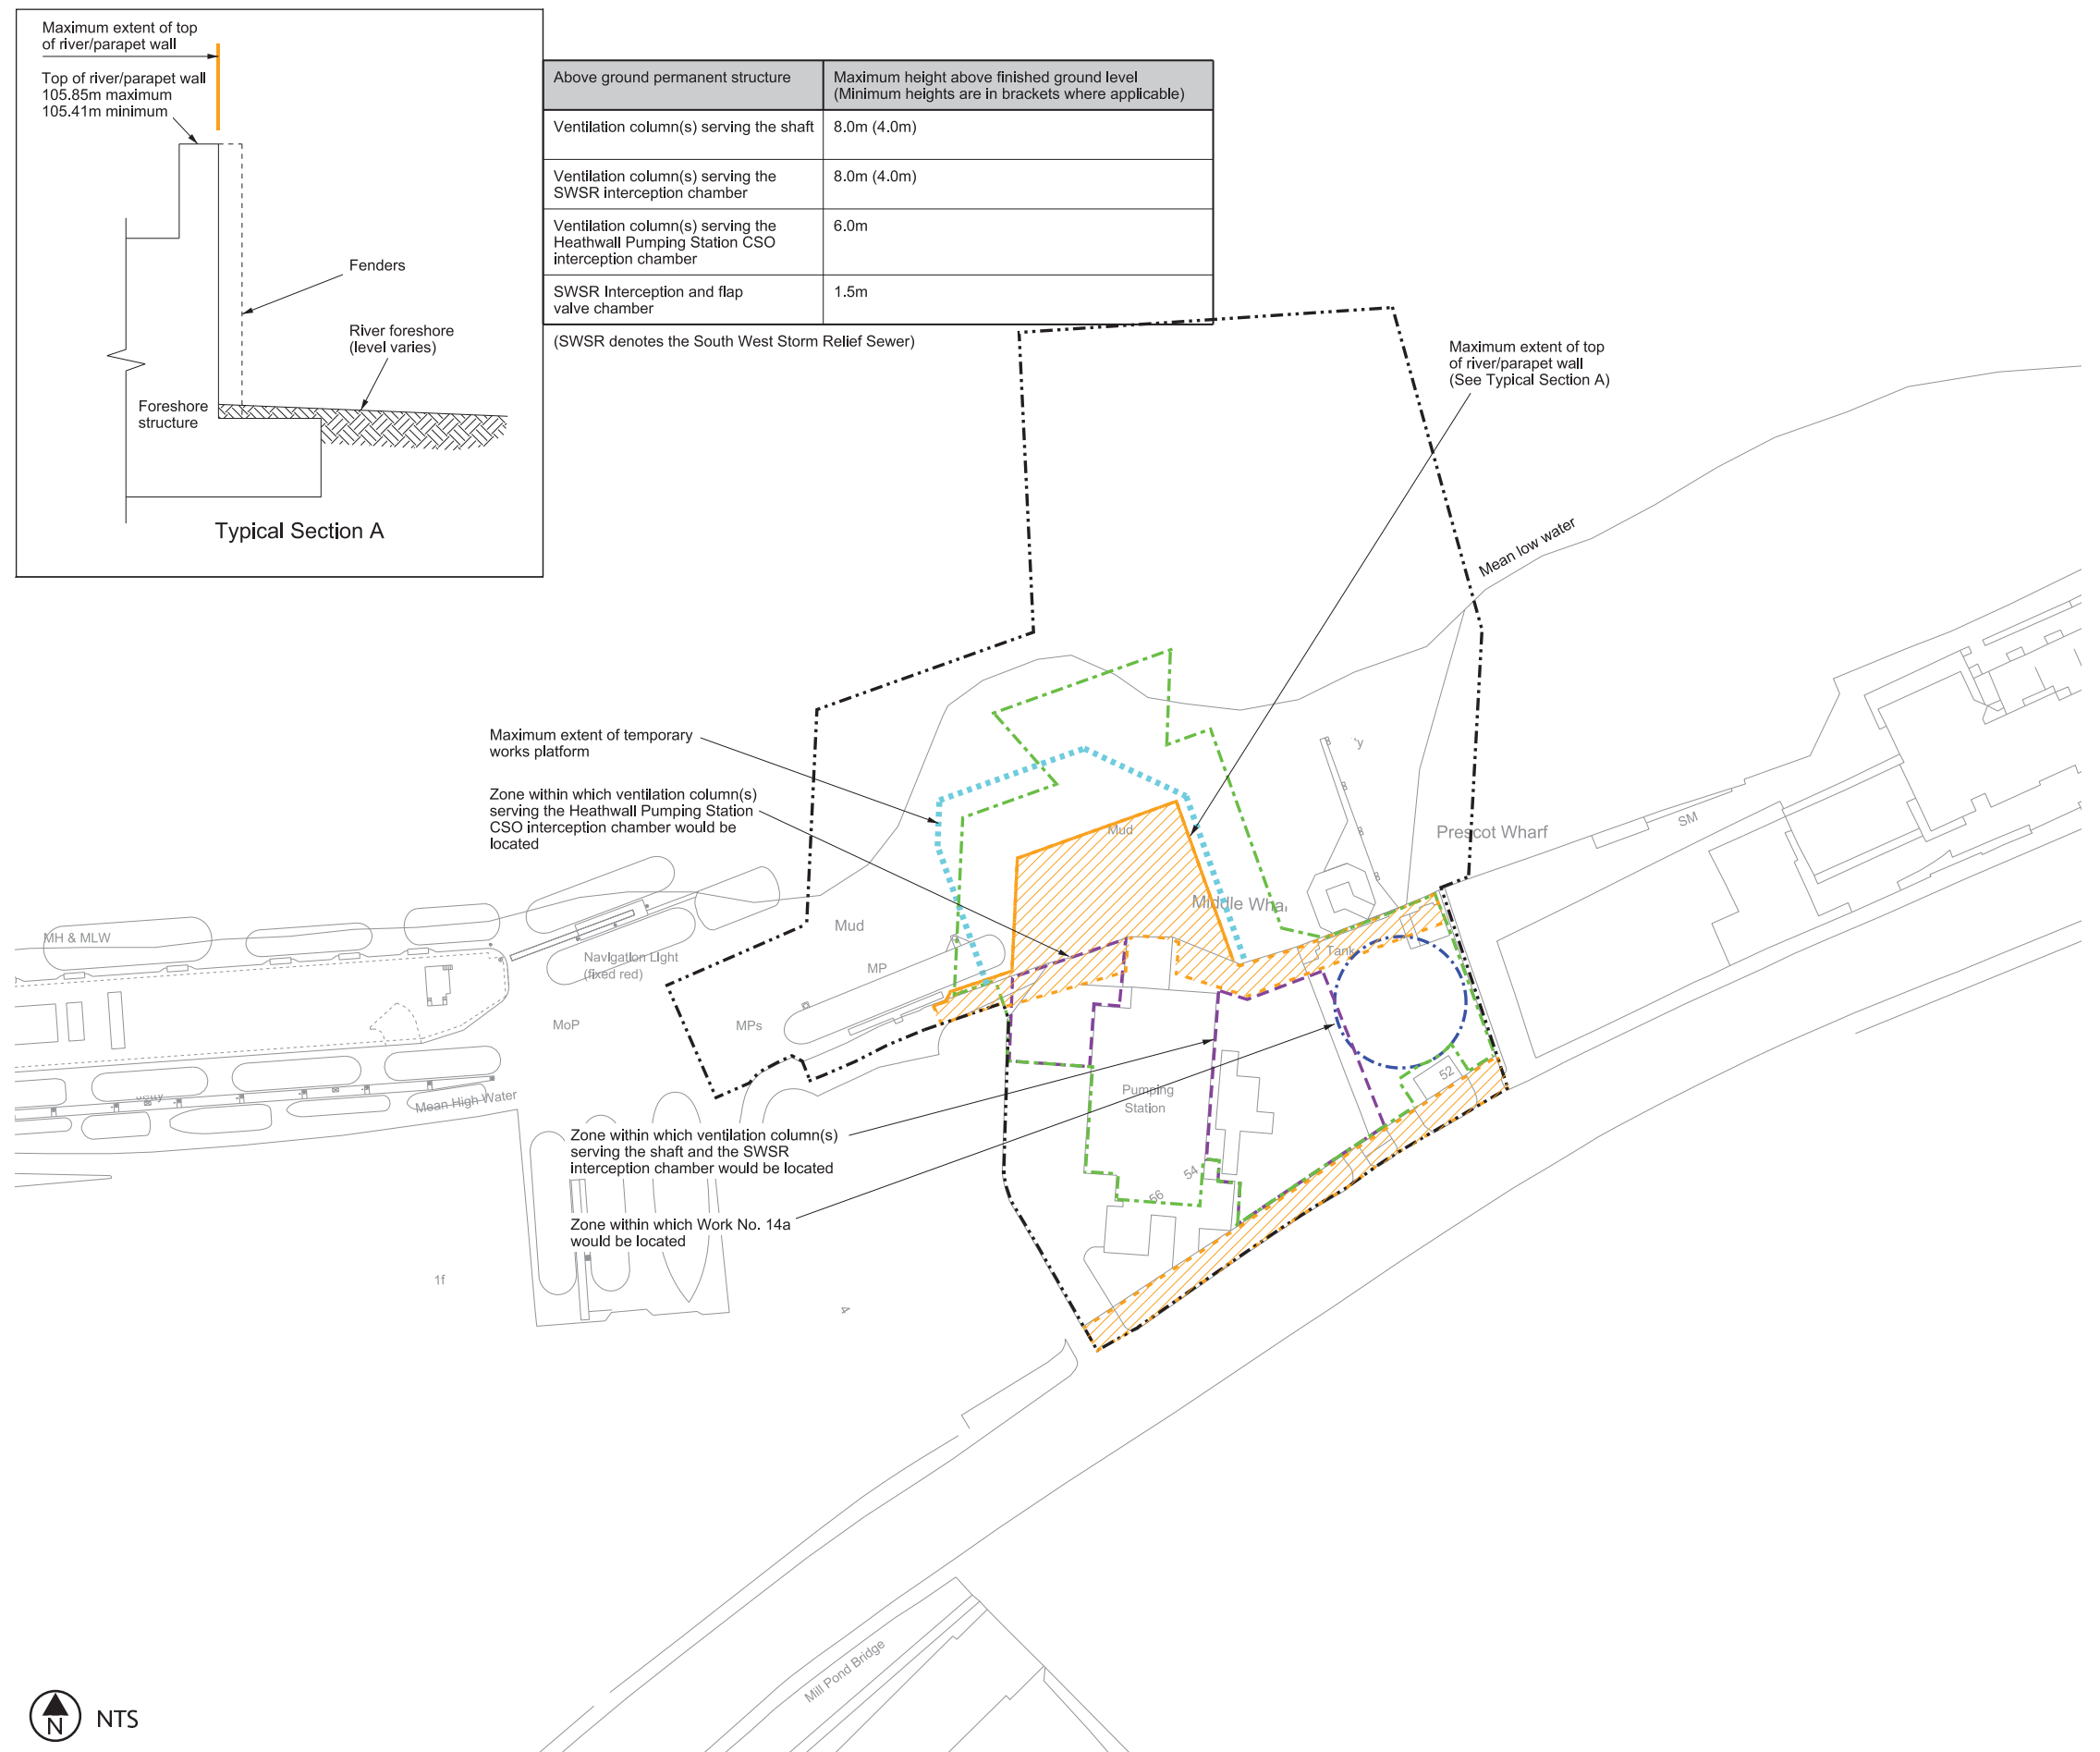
Proposed site works parameter plan - refer to Site works parameter plan in the *Book of Plans
